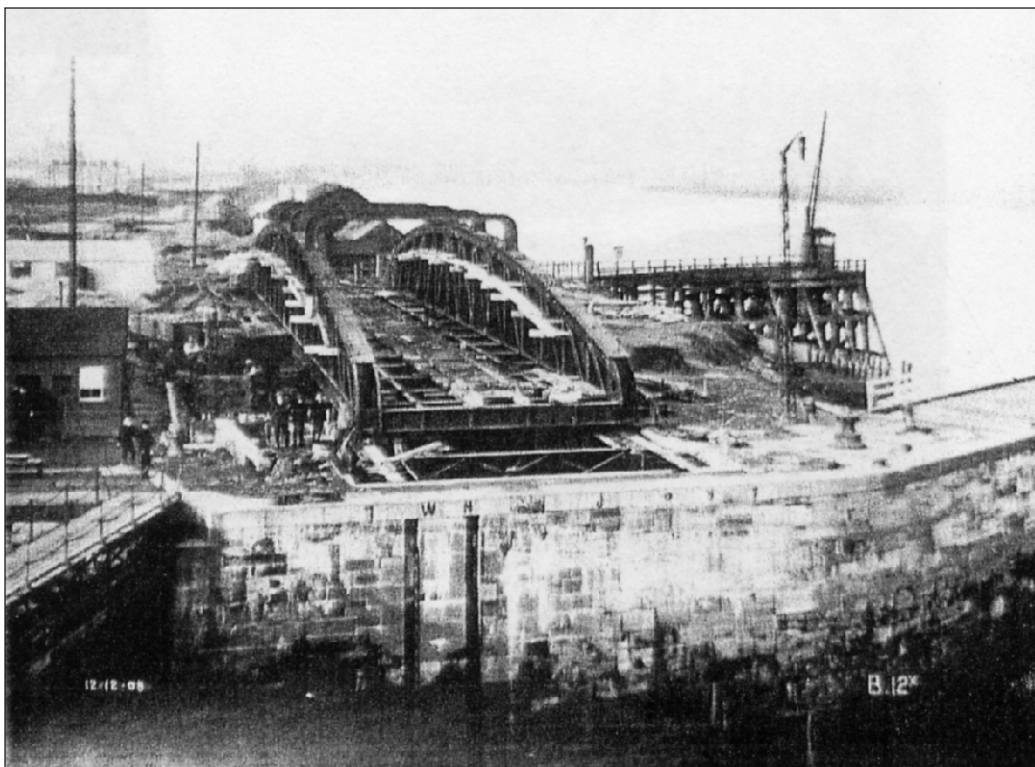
The rolling bridge under construction, December 1908 (© ABP)
